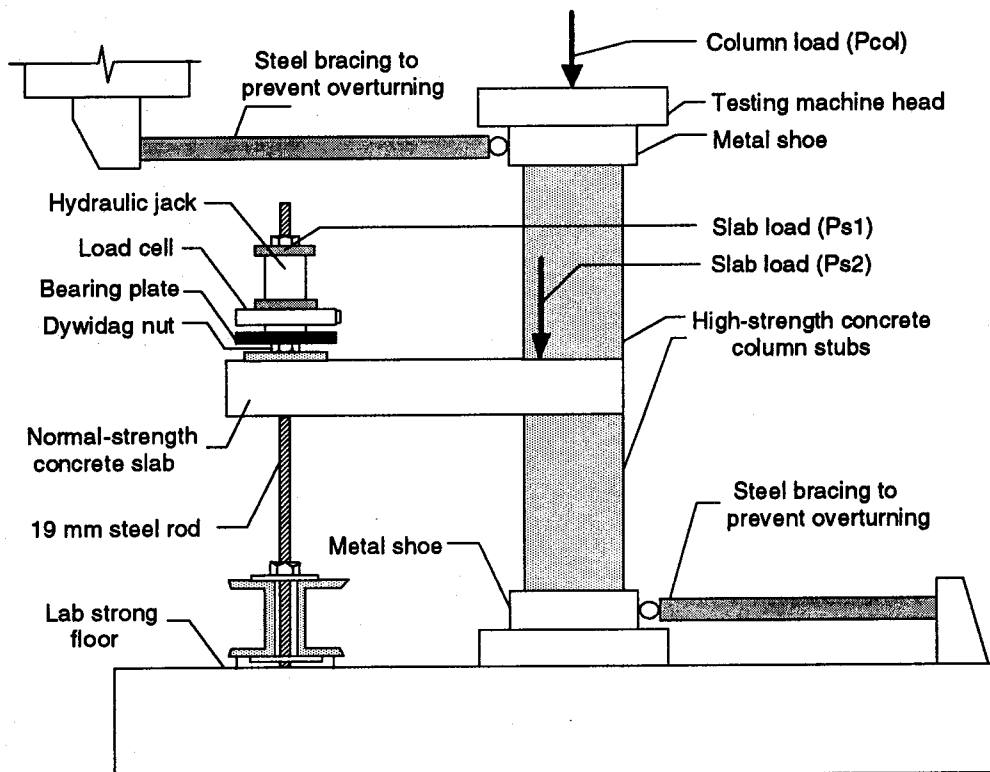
Test Set-up for Edge Sandwich Plate Specimens
